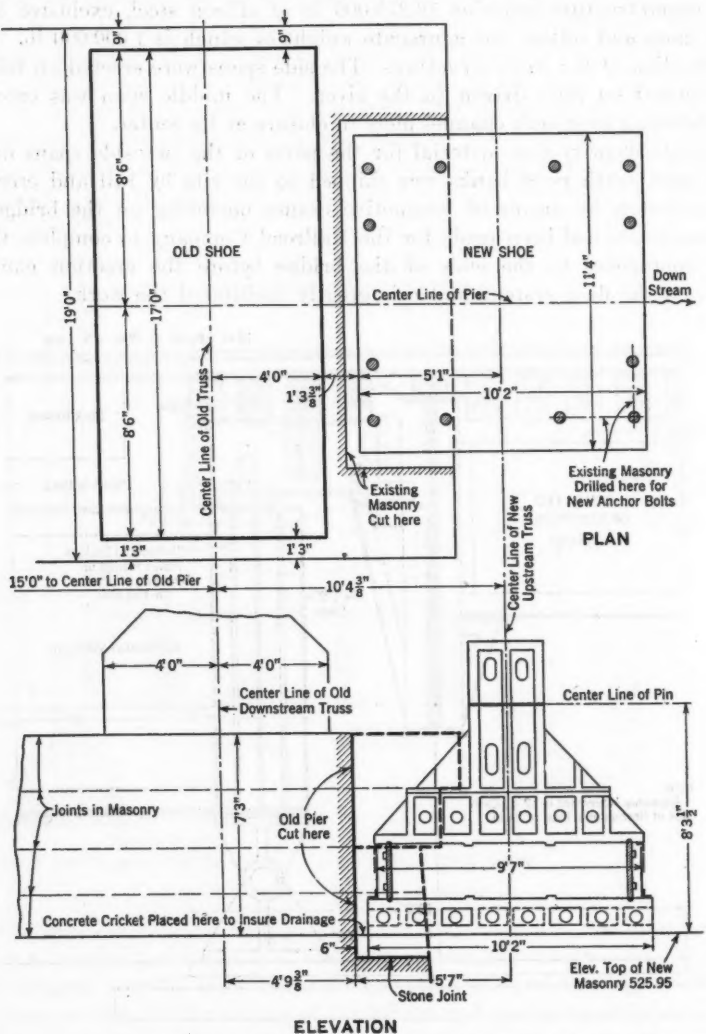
DETAILS OF CUT MADE IN OLD MASONRY TOP STEM OF SOUTH RIVER PIER TO PROVIDE ROOM FOR NEW SHOE
